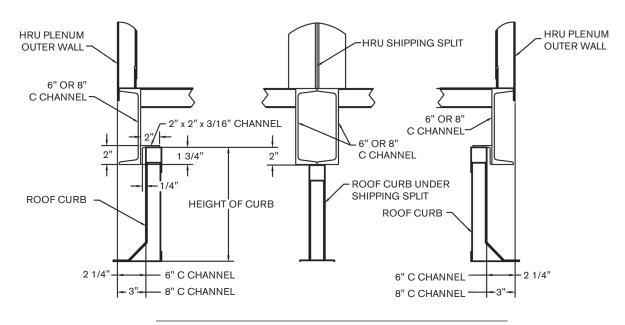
HRU Plenum with Shipping Split On Roof Curb
